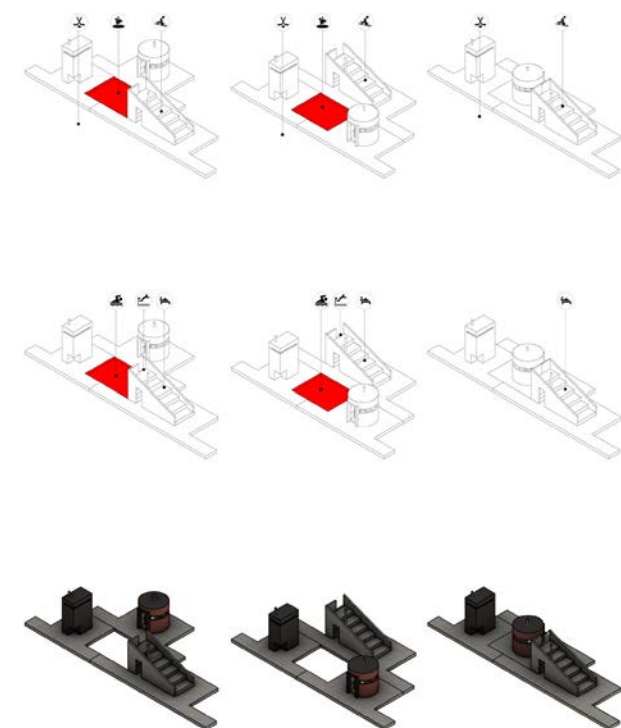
Axonometric design intent drawing of the collective sauna. Drawing by author.
